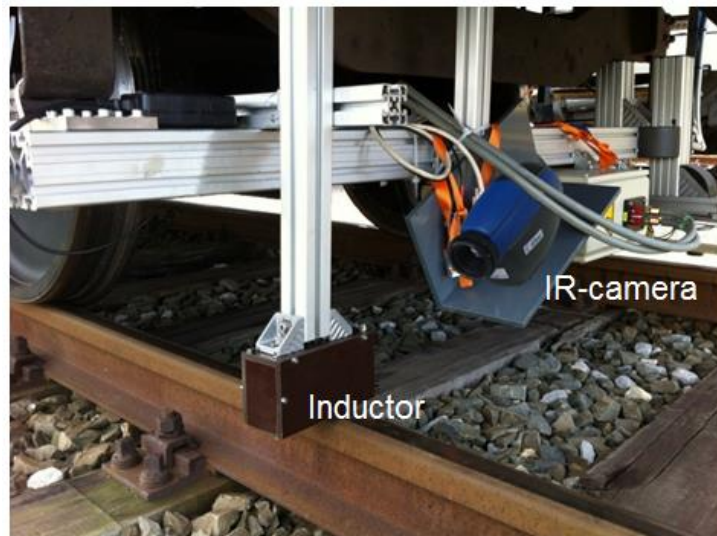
Thermographic set-up for rail surface defect testing mounted under a test car
